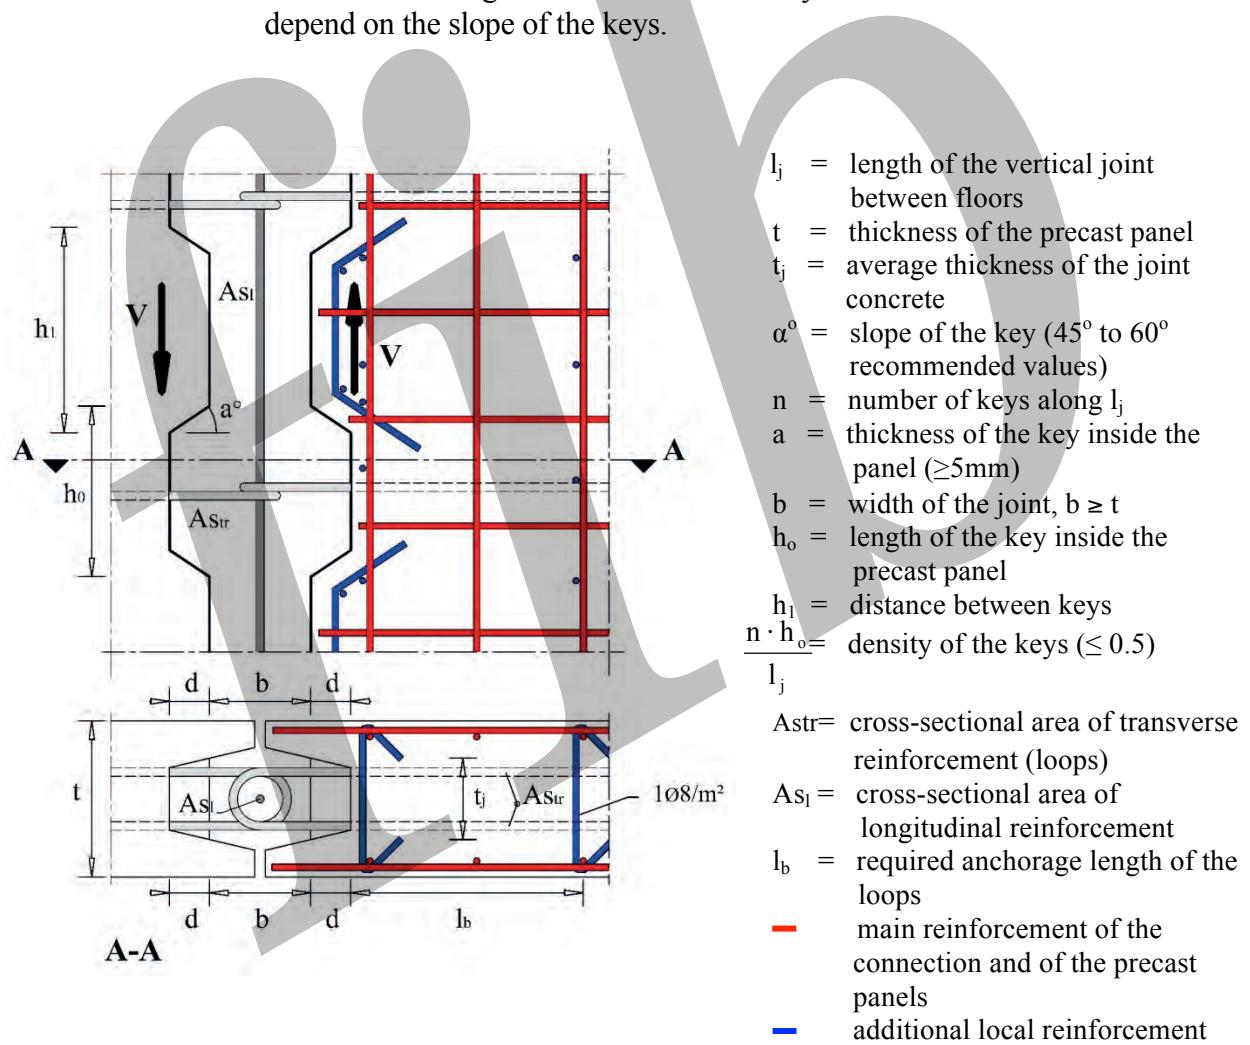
Typical reinforcement of a vertical shear connection of closed type and typical reinforcement of the precast panels (shown in one panel only)
